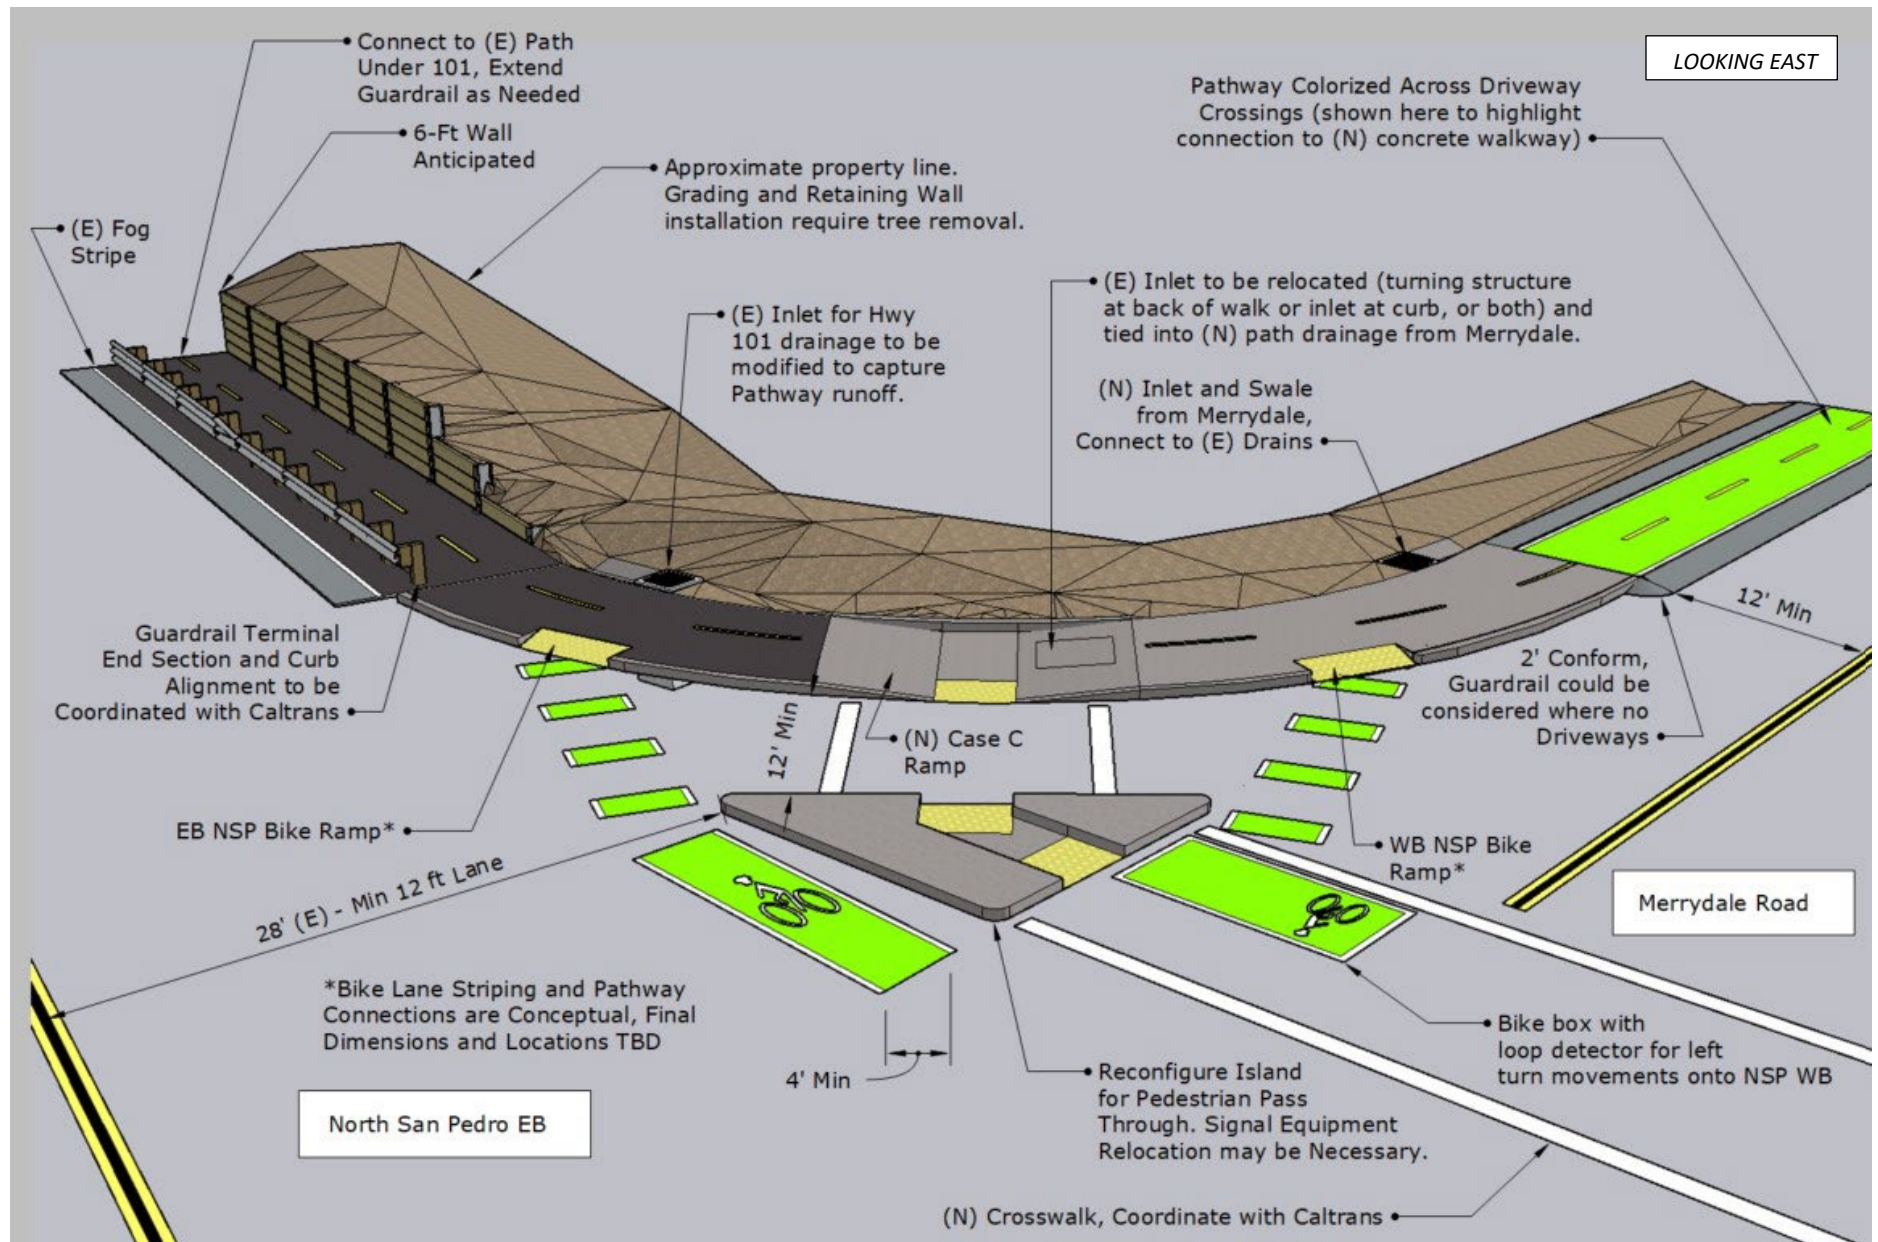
Cyan Segment – Connection to North San Pedro Road Intersection and Light Blue Segment
